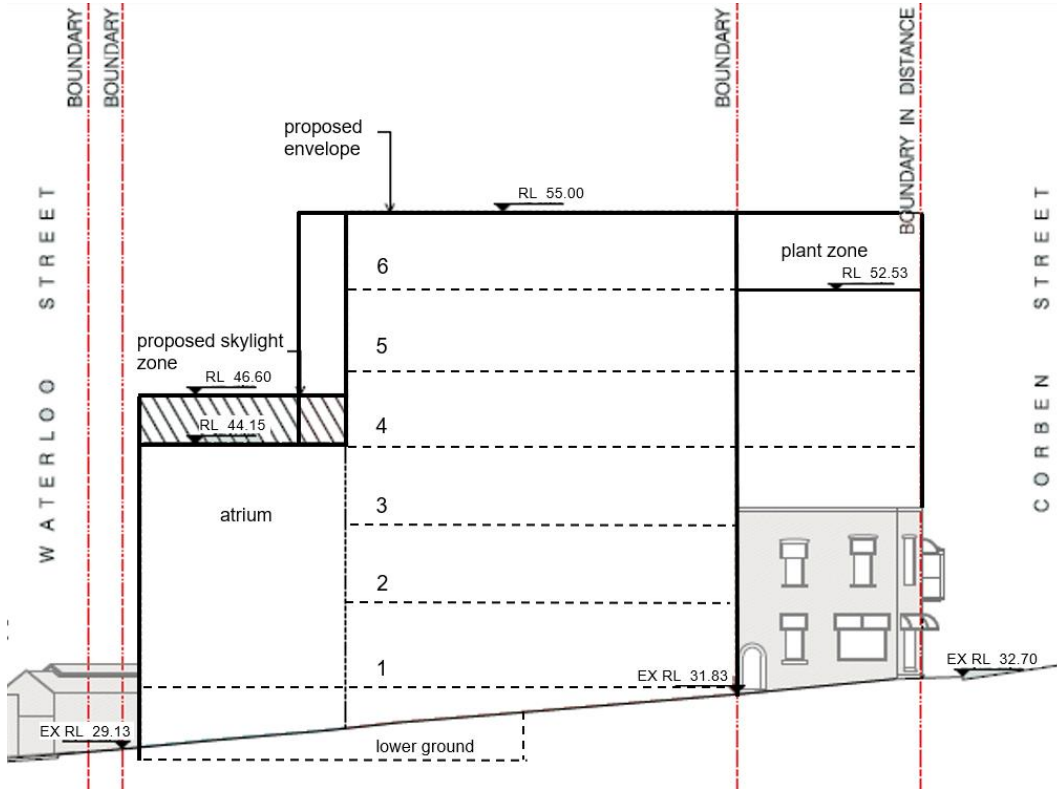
XX: 72-84 Foveaux Street – Foveaux Street elevation
